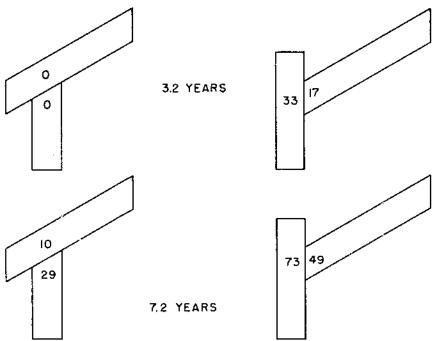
Amount of decay (on a scale of 0 to 100) in painted step rails and newels when the rail abutted or capped the newel.
